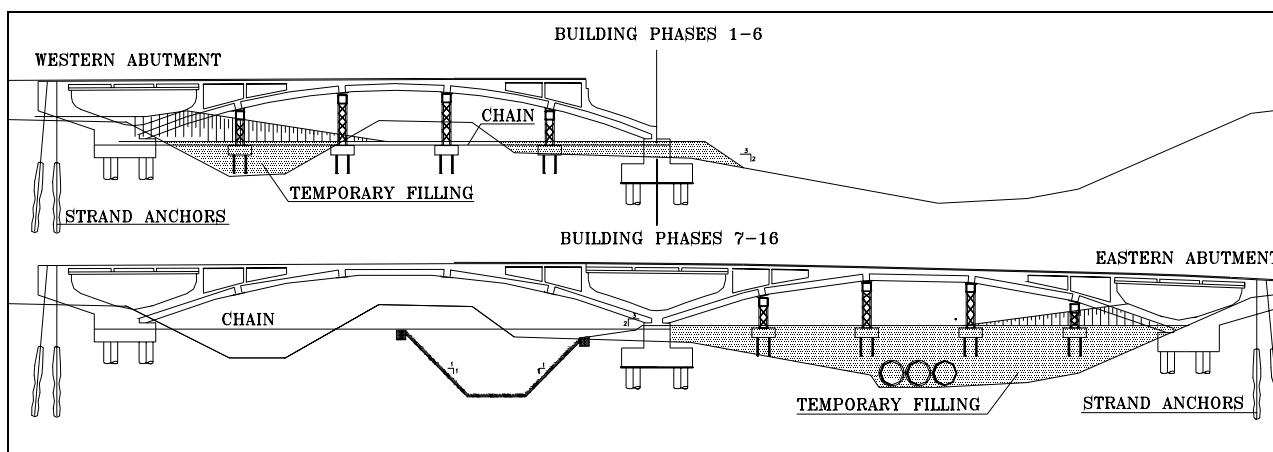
Bridge over river Sacco, to be constructed, end 2001
